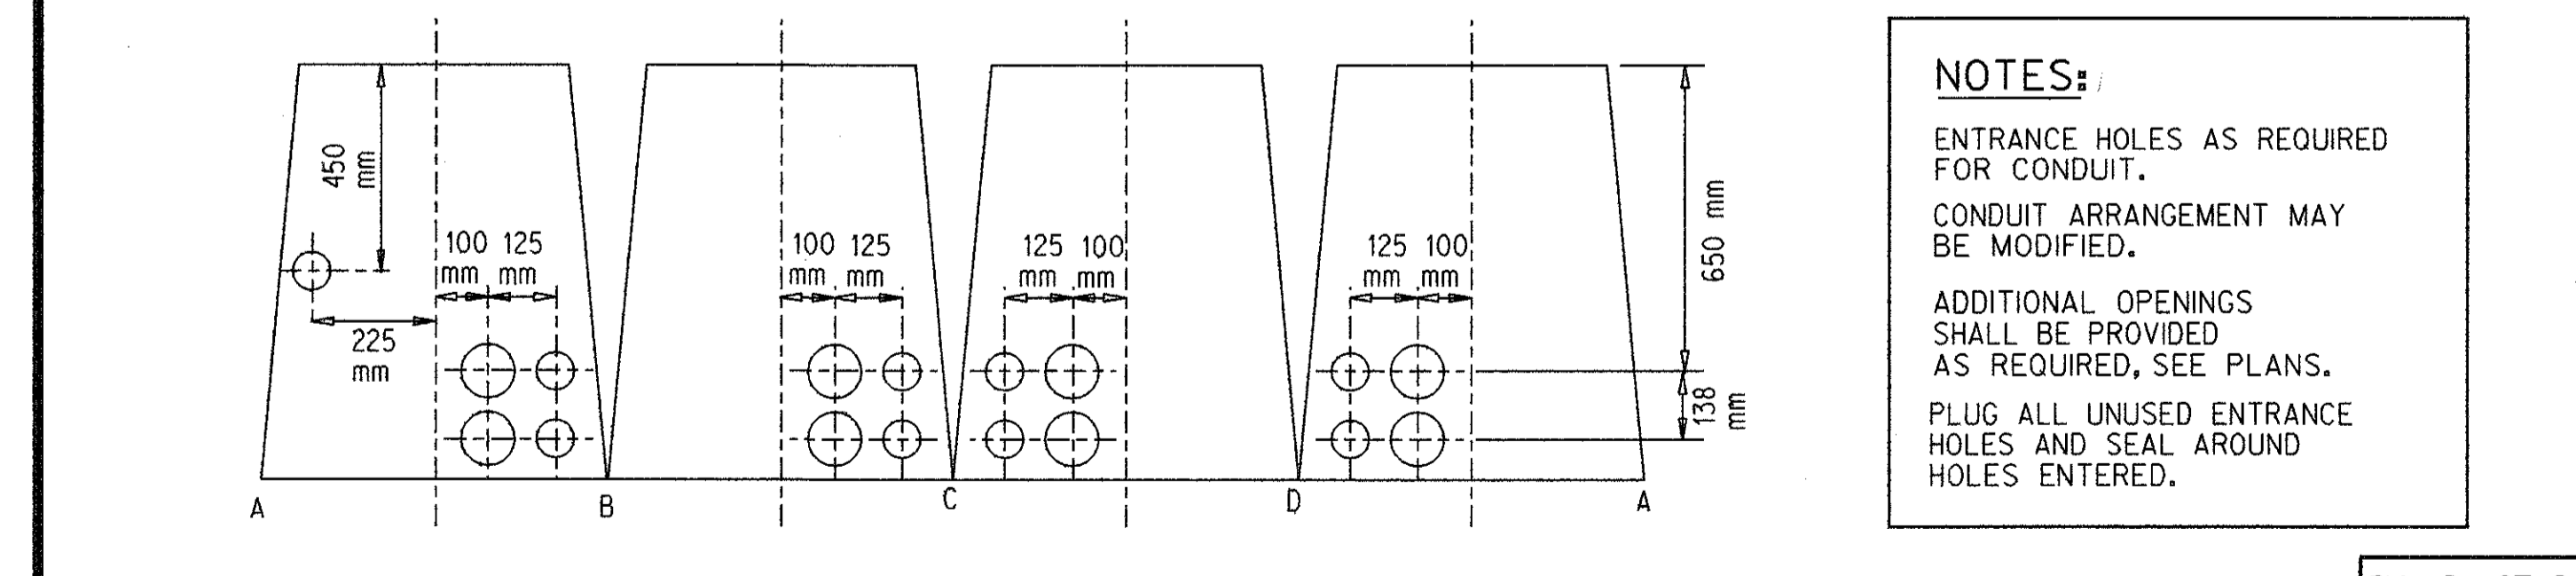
DETAIL (ALTERNATE): PRECAST CONCRETE HANDHOLE
